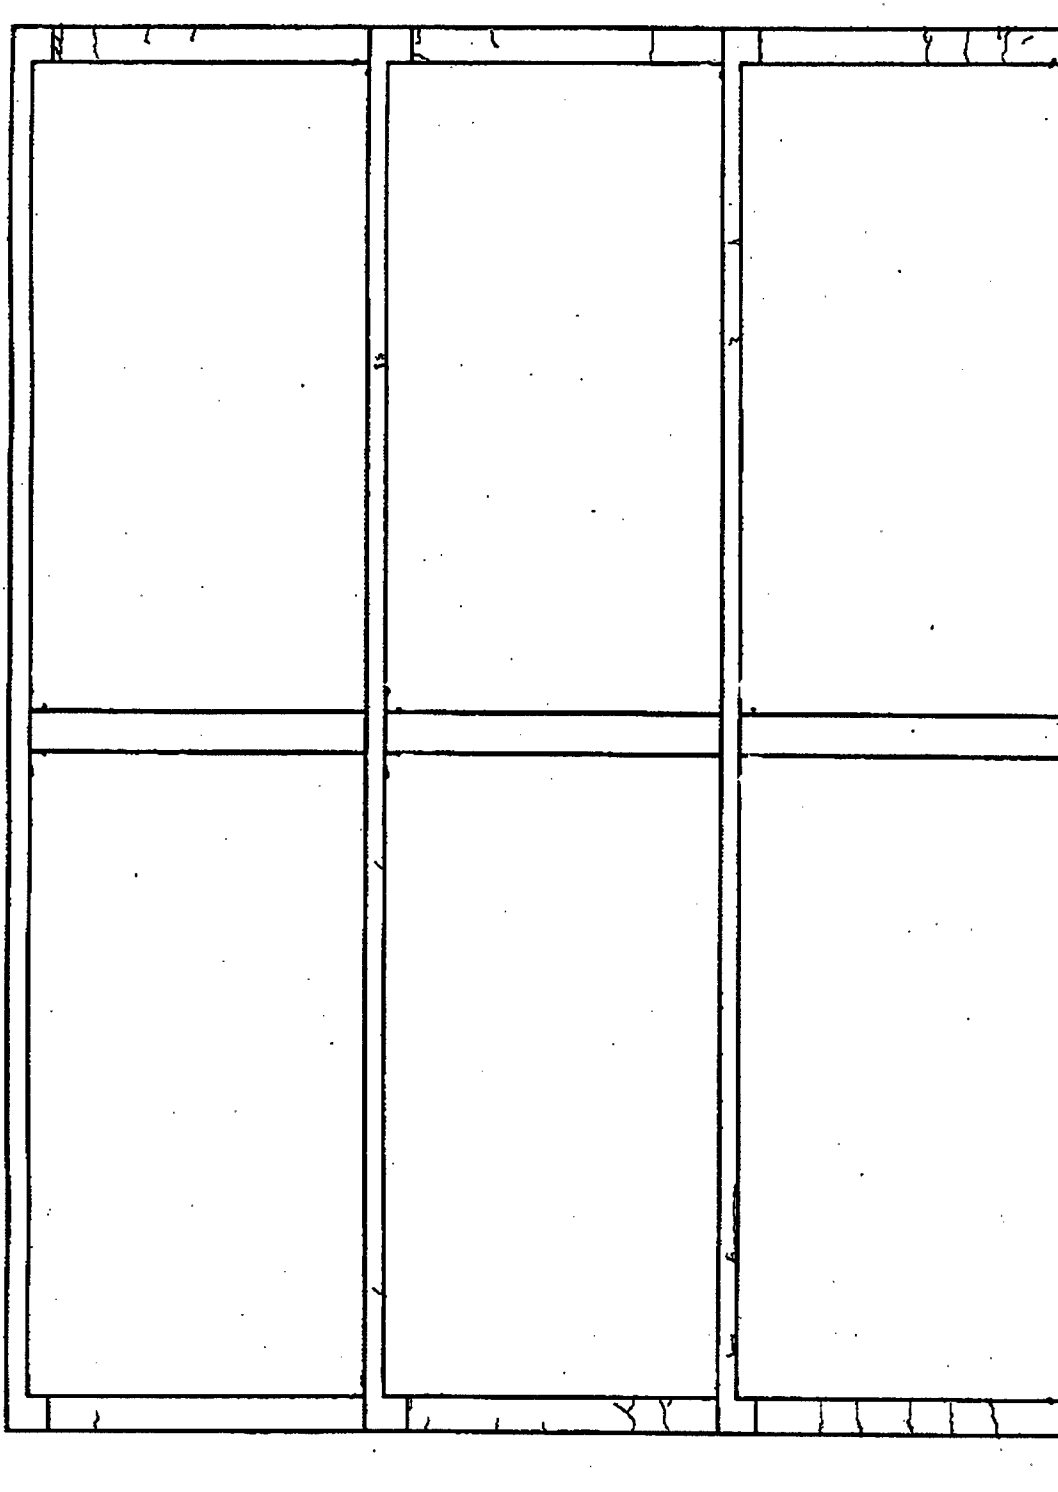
Crack Pattern, West Side of West Columns, Pre-Test
